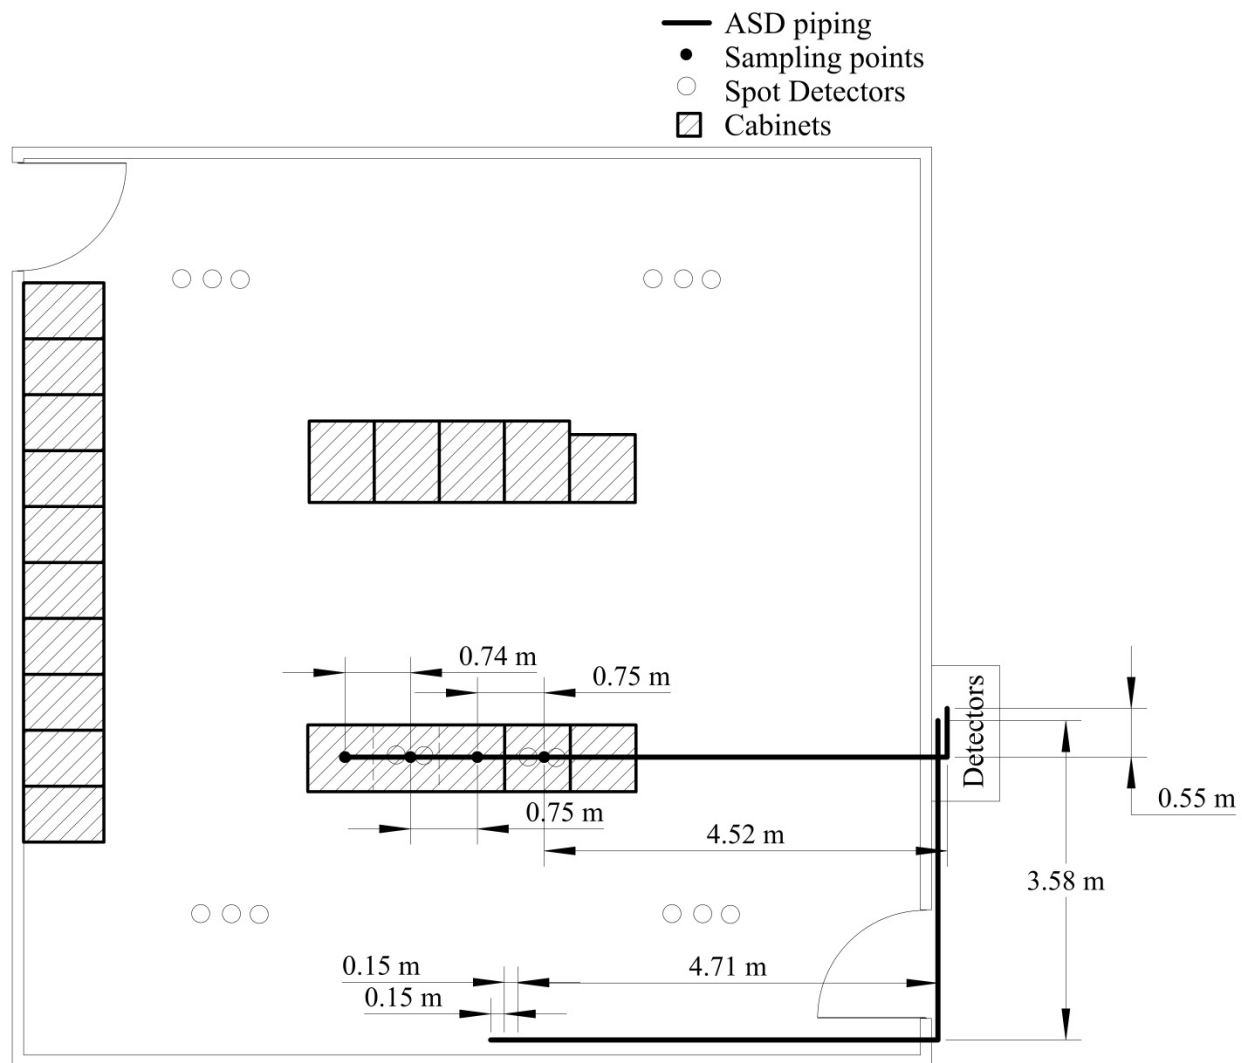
ASD5 piping layout for the in-cabinet and HVAC inlet sampling
